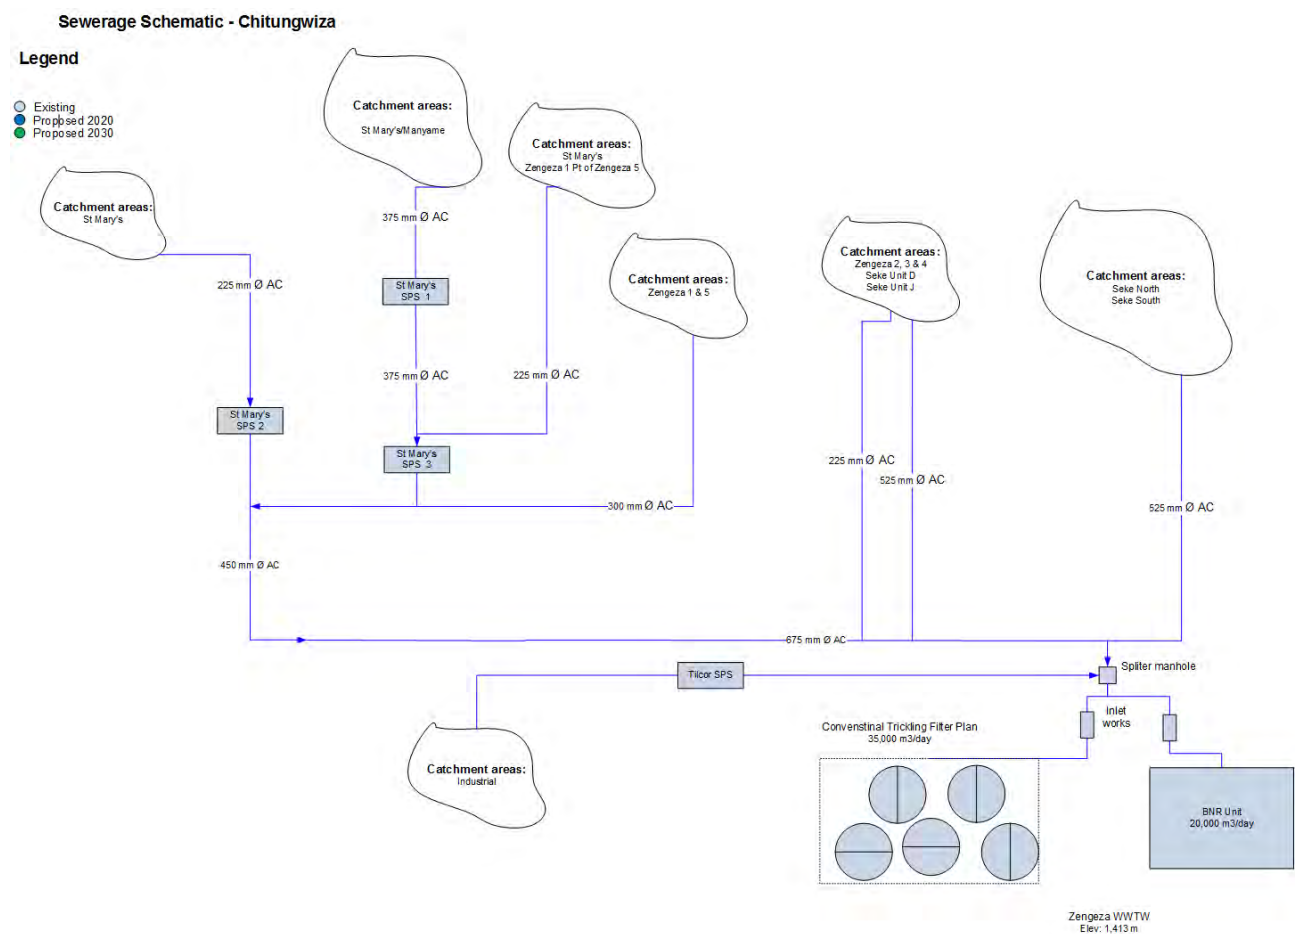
Schematic Layout of the Sewerage System of Chitungwiza
